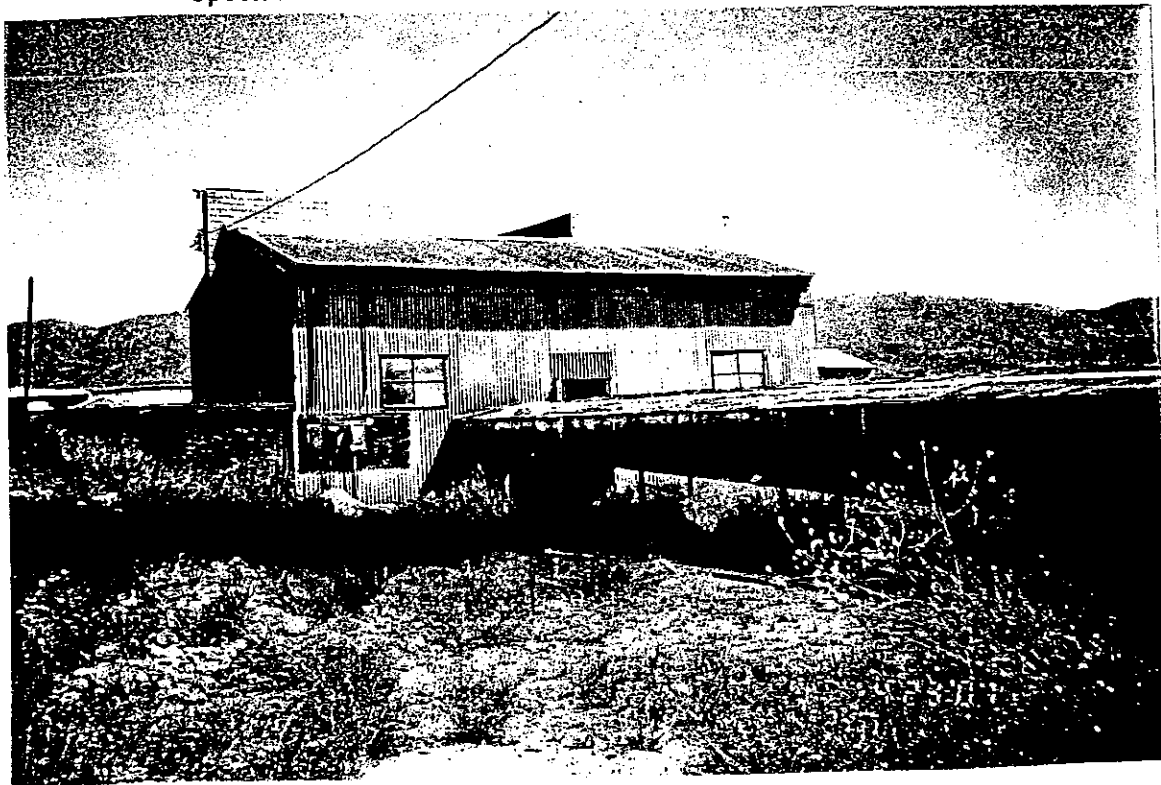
General view of former press and manufacturing building located in west-central portion of site. Note connecting conveyor system.
